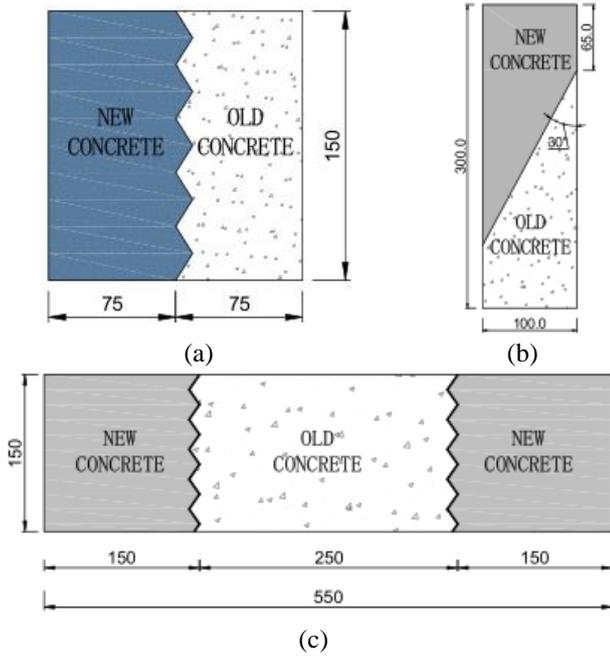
Specimen details for the (a) splitting tensile test (b) Slant shear test (c) Double-shear test
